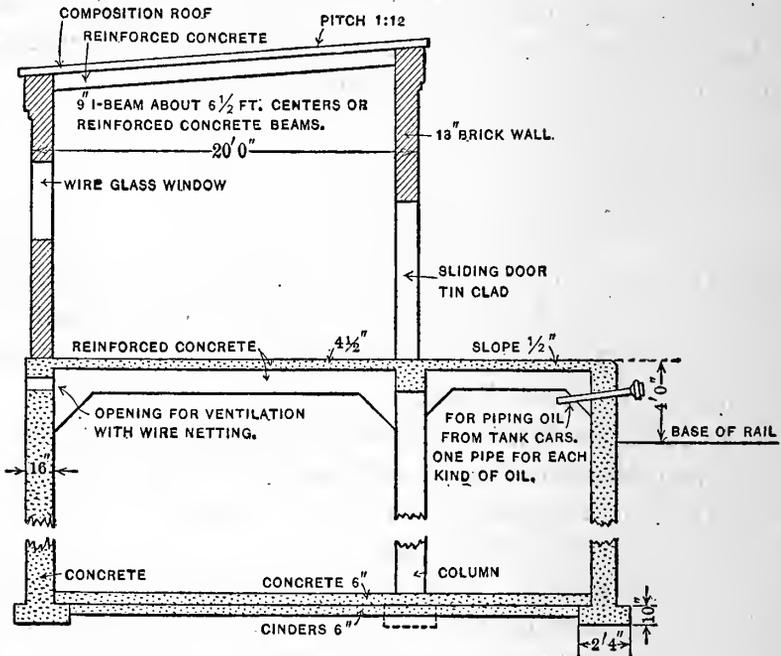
CROSS-SECTION OF TYPICAL OIL-HOUSE.
